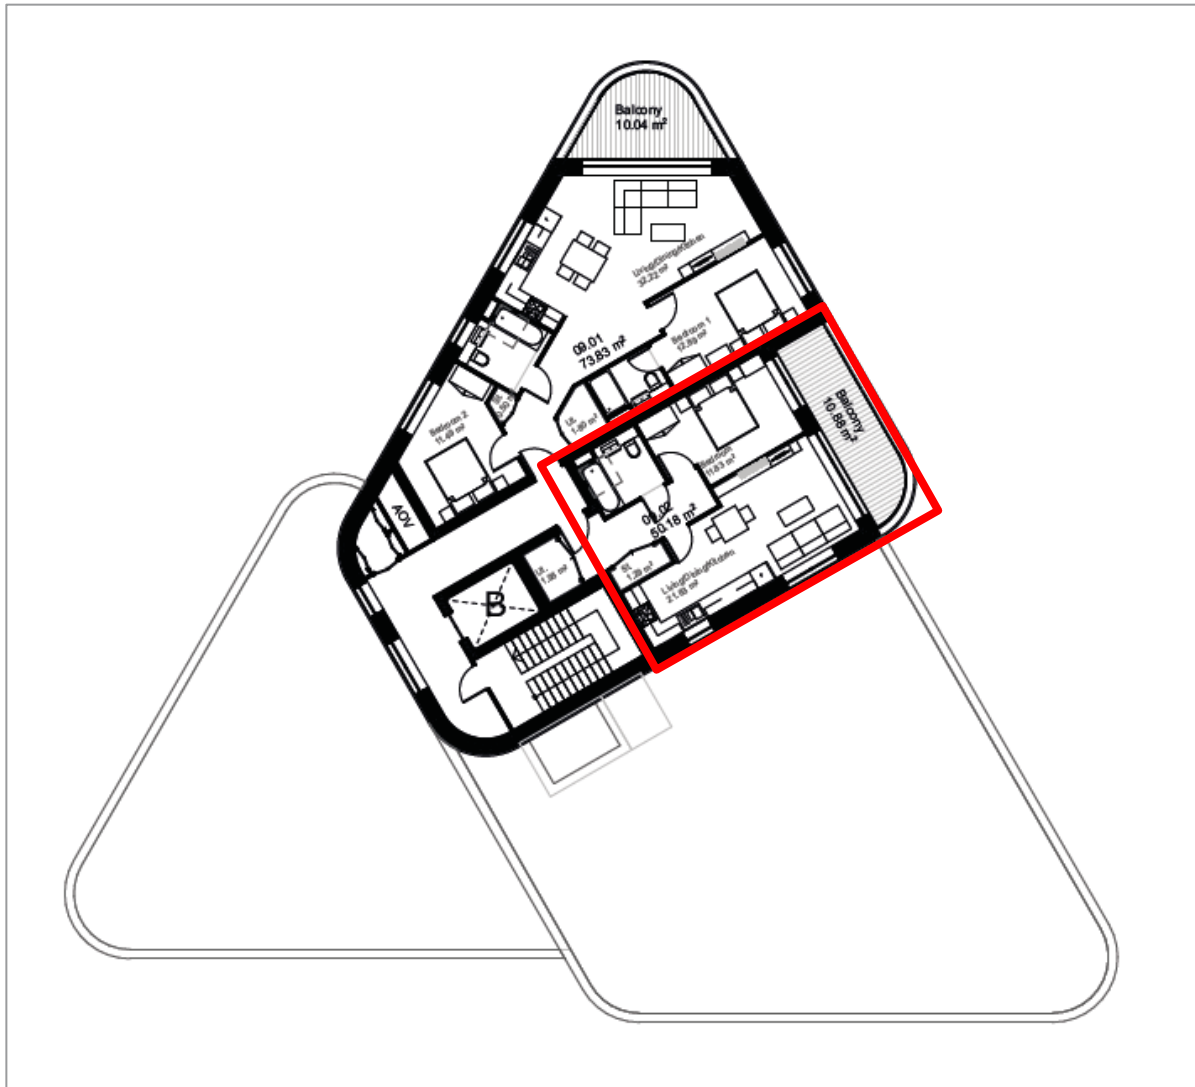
9th floor plan, B.08.02 Top-floor dual-aspect south facing 1bed apartment (Source: Stock Wool Architecture 17.12.2020).
